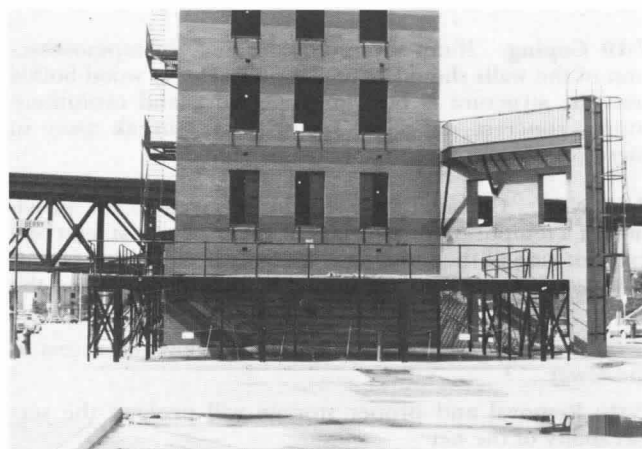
(a) Frame of the net. New York Fire Department Fire Academy, New York, New York.
